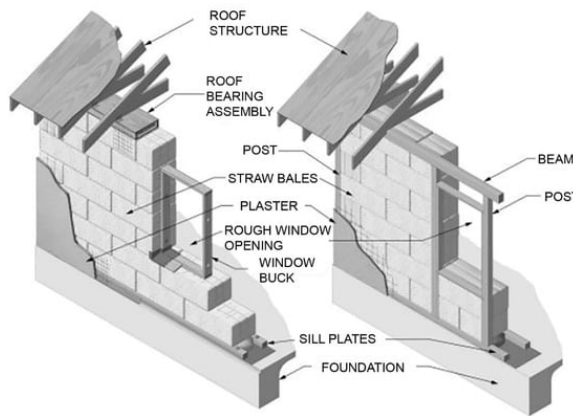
Load-bearing (left) and infill (right) straw bale walls (Cascone et. al., 2019).
